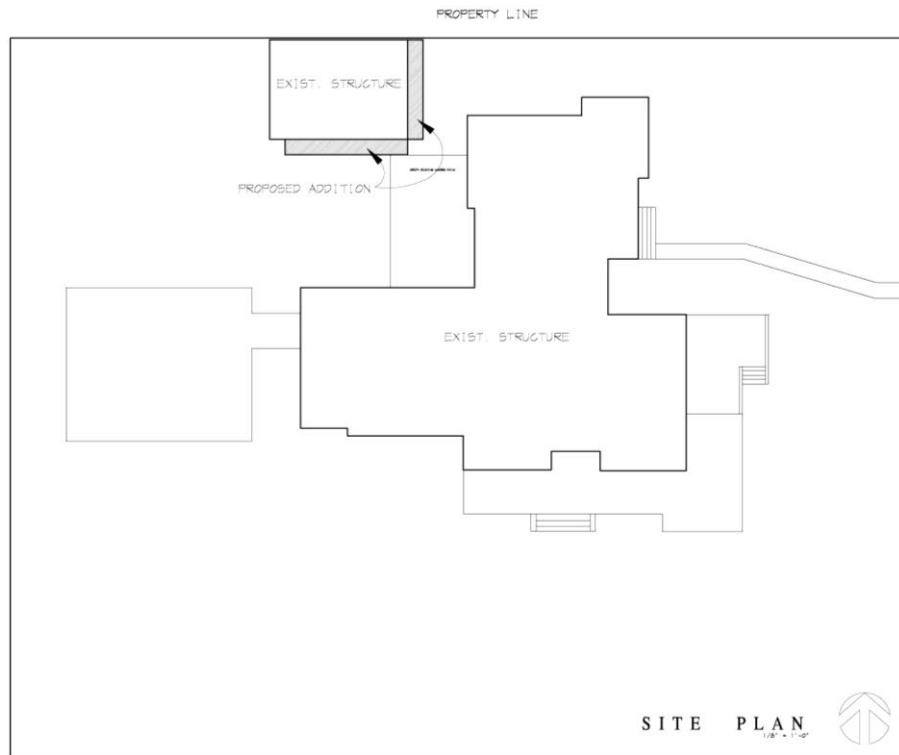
541 Highland Ave., proposed site plan, 2015.
